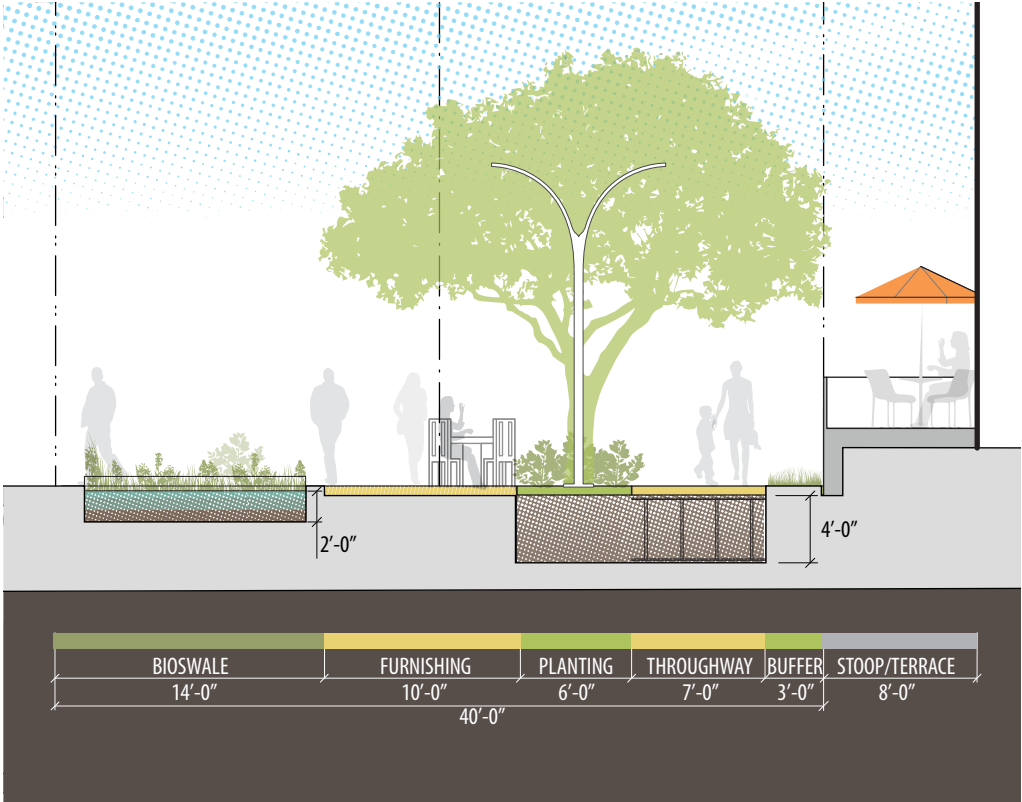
HILLSIDE LANEWAY SECTION-TYPICAL
